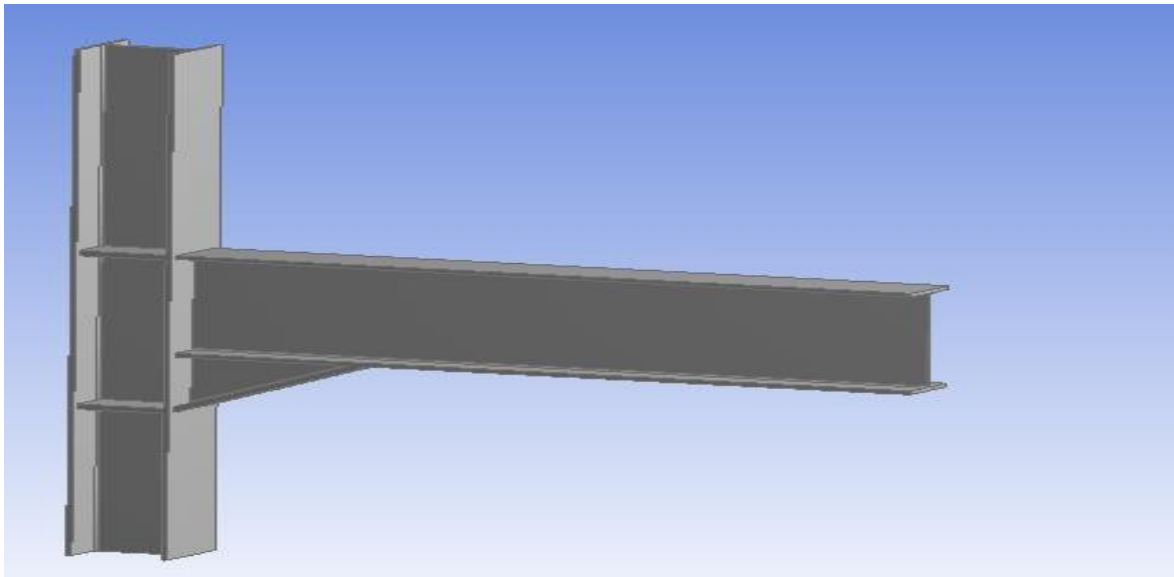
Design 1 showing direct joint of beams perpendicularly
